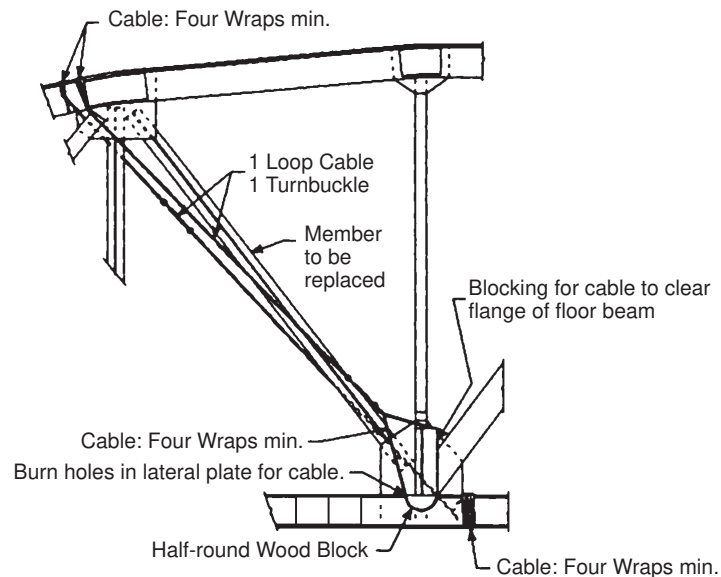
Truss Diagonal Replacement for Riveted or Bolted Connections
